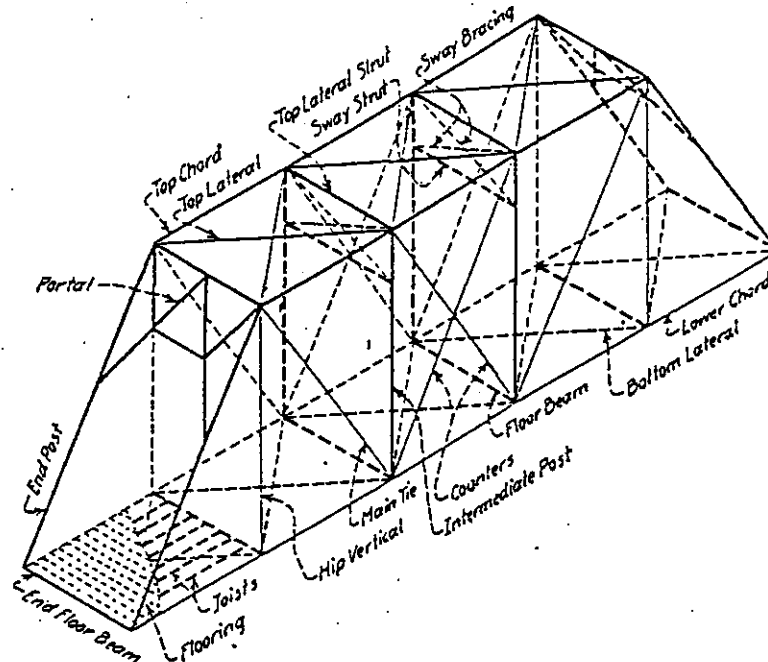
DIAGRAMMATIC SKETCH OF A THROUGH PRATT TRUSS HIGHWAY BRIDGE.
